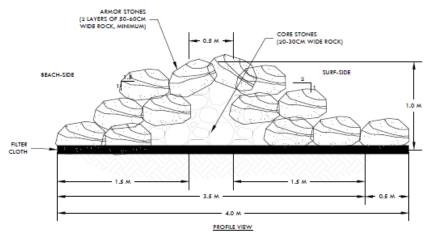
Details of the design of the semi-permeable living breakwater in Loong.
